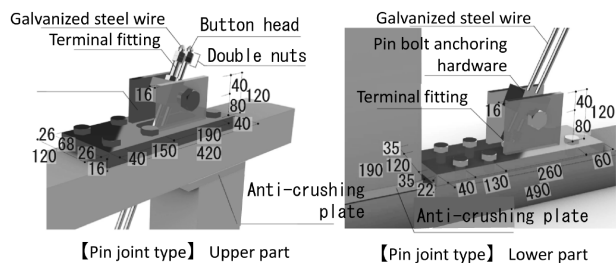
Structures of Anchoring Fittings [pin joint type]
